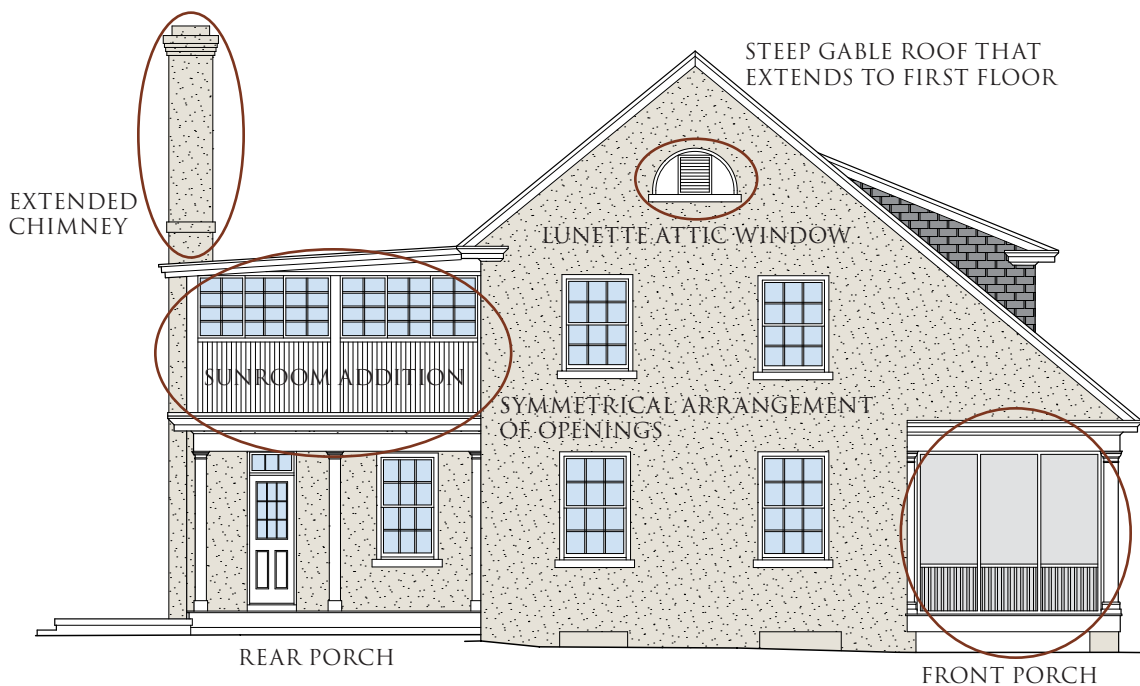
On this elevation, the placement of a louvered vent in the lunette attic window opening is depicted in addition to other non-original elements.
